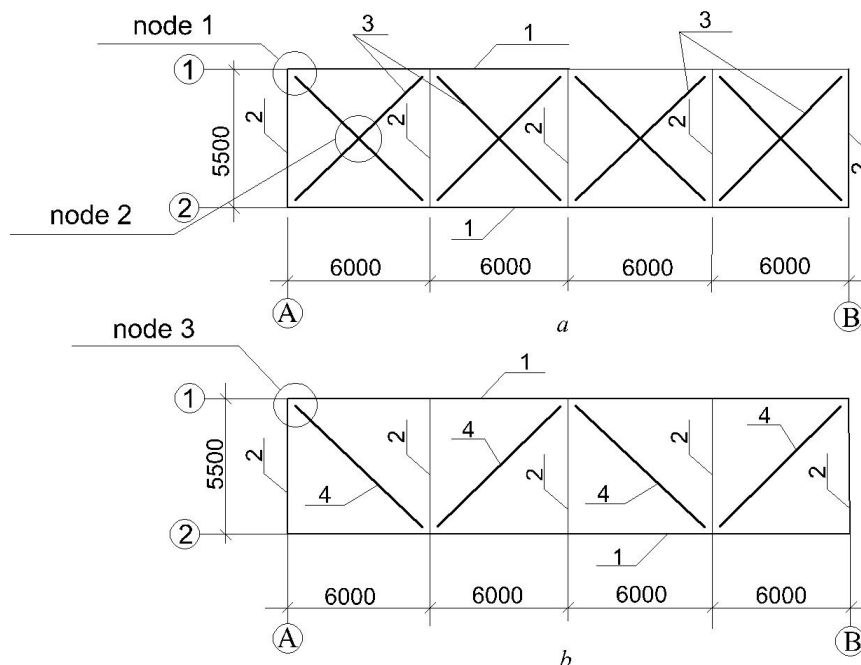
Schemes of node trusses along the bottom chords of trussed rafters in the end node blocks of single-storey industrial buildings with the span 24 m
